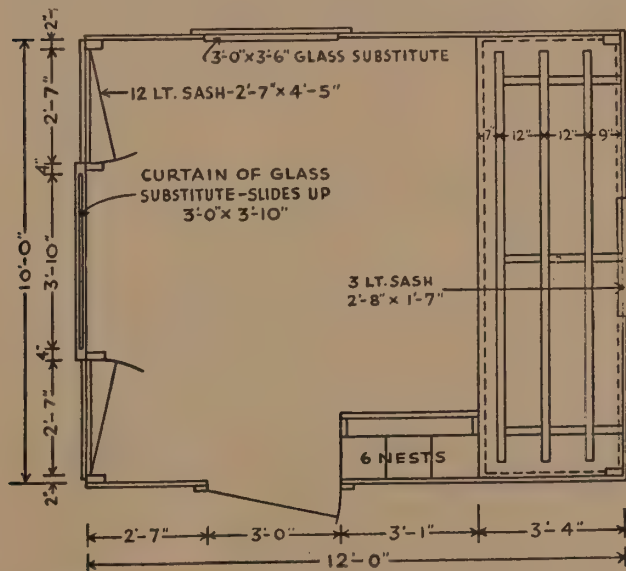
Floor plan of the New Jersey house. Roosts and nests will be omitted when house is used for brooding
